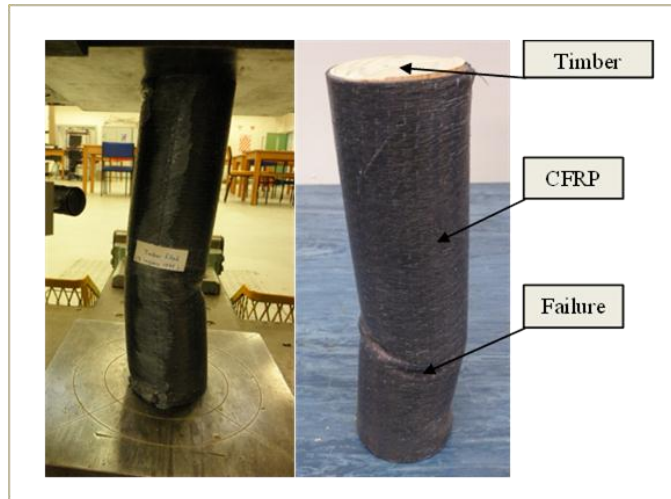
Timber filled CFRP confined specimen (TIMC.4) after failure.
